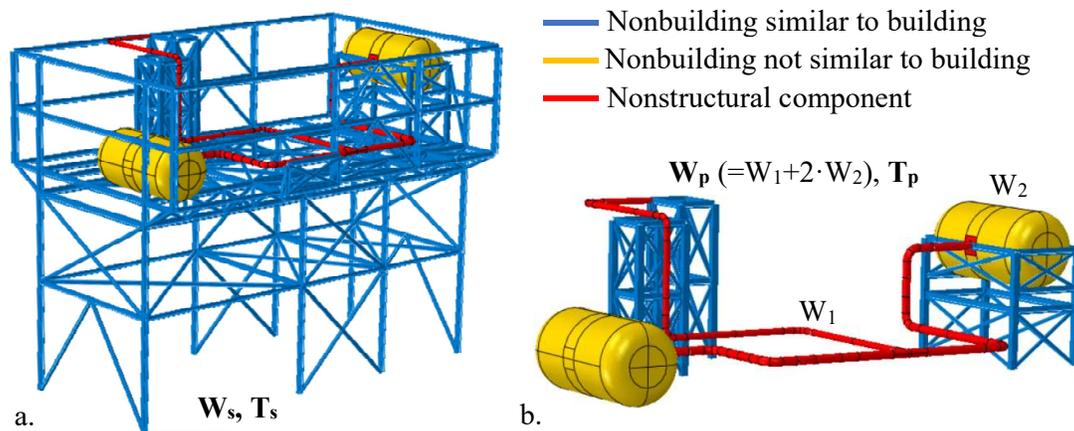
a. A steel nonbuilding structure, b. the piping system considering the towers that is support
